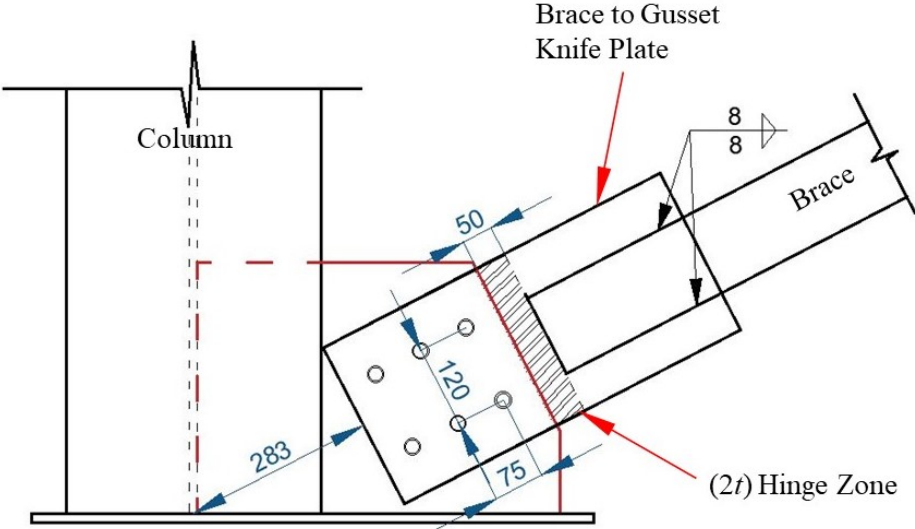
Base corner gusset plate connection for first-storey braced module (dimensions in mm)
